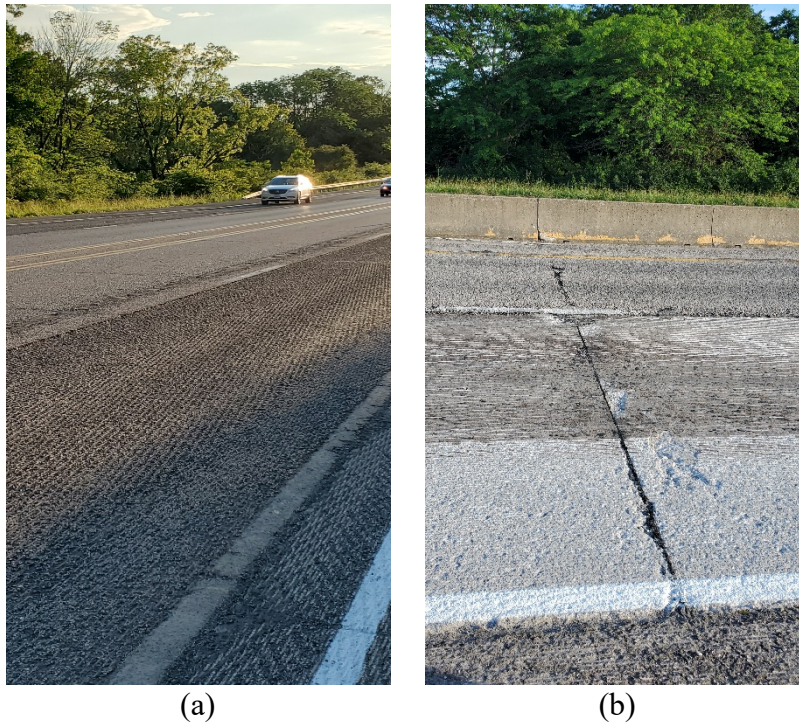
(a) Example of underlying asphalt pavement on the western-most stretch of the 50PEL and 10ECR sections, (b) Example of underlying concrete sections on rest of the project
